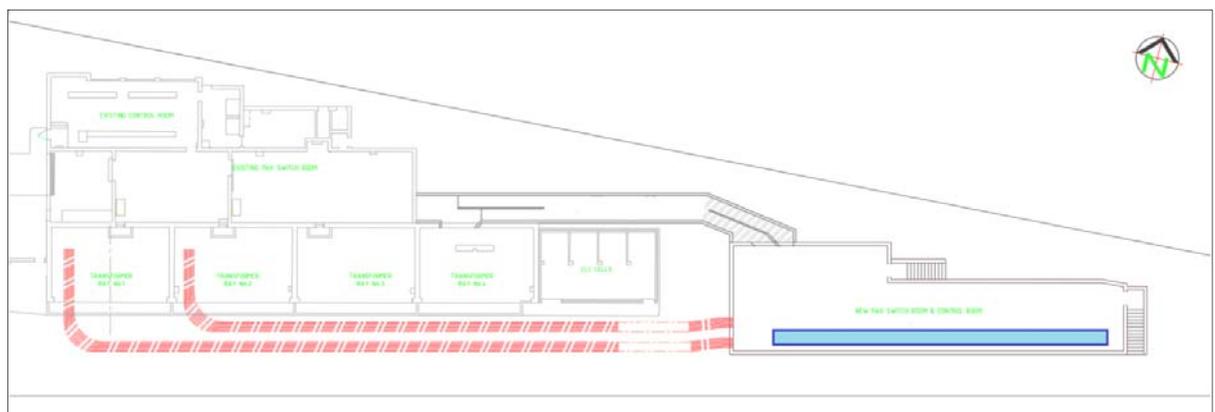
Plan view of Concord Substation with 2 sets of underground 11kV transformer cables connecting Transformer 1 and 2 to the new 11kV switchboard
